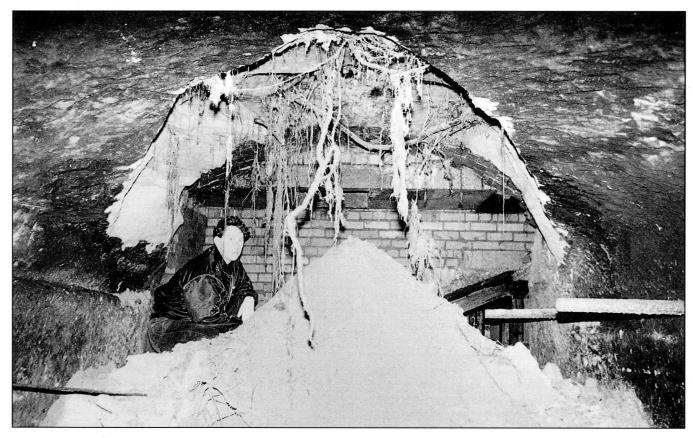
Tree roots hang from the failure zone where a crown hole developed beside North Sherwood Street. The roof sandstone was little more than 1 metre thick, and tree roots had grown into it from a thin soil cover. The fallen debris on the floor is broken blocks of sandstone capped by a cone of completely weathered sand and soil. The brickwork in the background is not related to the failure (photos by Tony Waltham).
